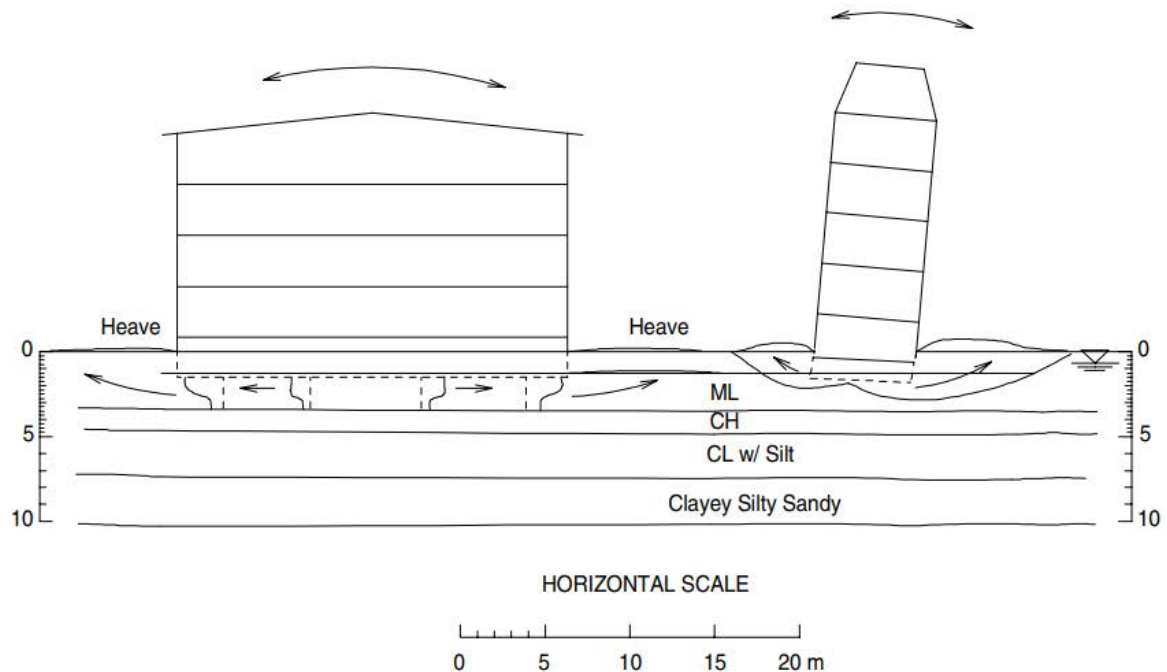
Modes of failure of stout and slender buildings in Adapazari.
